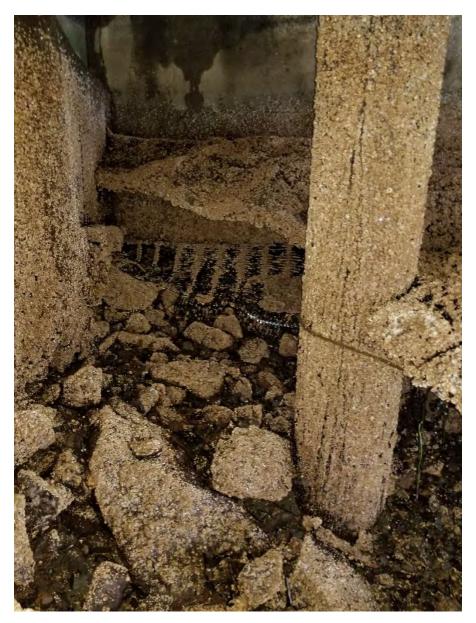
Eastern wall in initial excavation, 10/5/2020, view looking east. Note treated timbers in north sidewall (left side of photo)
